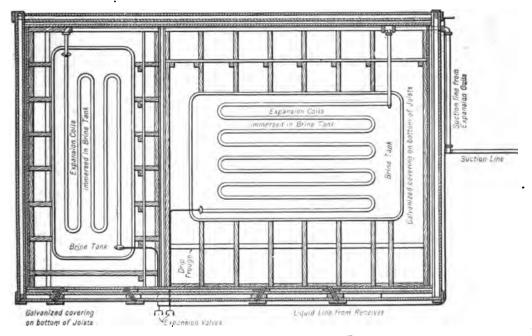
PLAN OF SMALL COLD-STORAGE ROOM.
